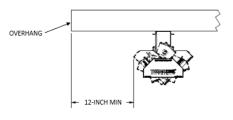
PROTECTED AREA CEILING MOUNTING
